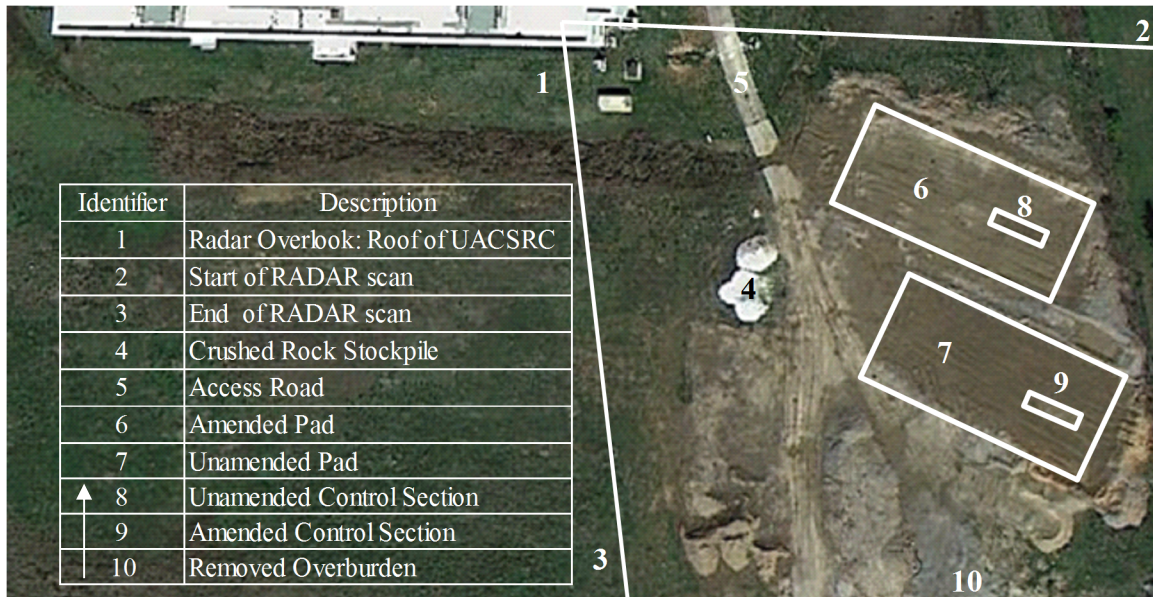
Layout of project site including the locations of Sections 1 and 2 and the overlook site on the roof of the UACSRC building (image modified from Google 2012 as cited in Garner and Coffman 2016) [in color].
